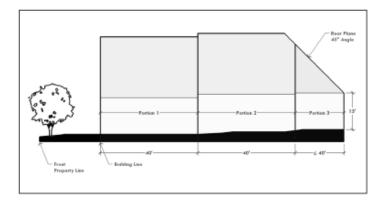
(Elevation View) Rear Setback Plane (Level Ground)
